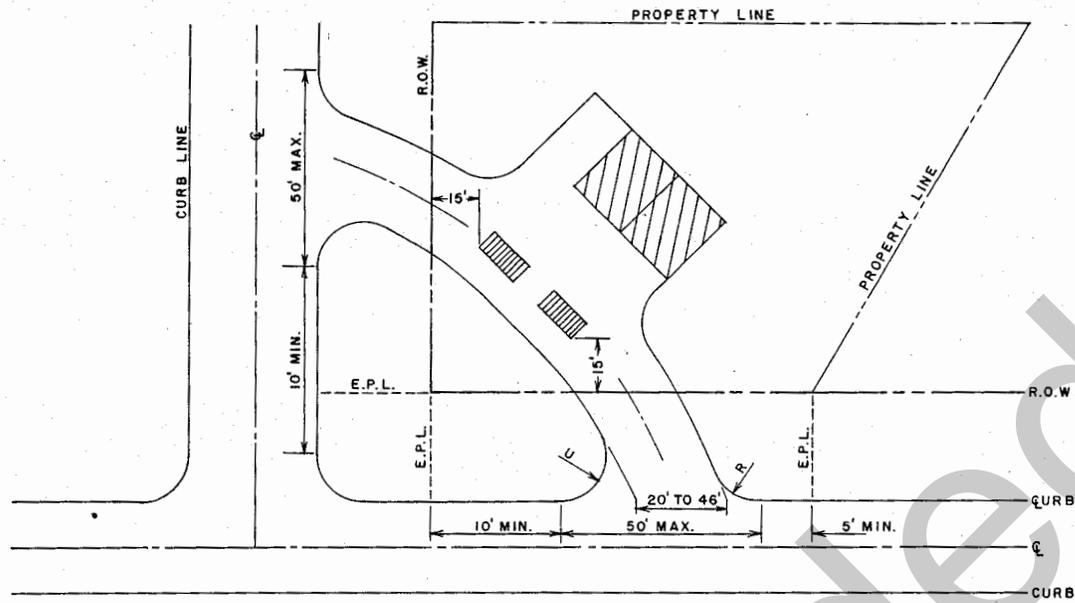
DRIVEWAYS TO A PUBLIC BUILDING: Figure 11 shows two driveways connecting to a sizeable roadside development along an undivided highway. The driveways are planned for one-way use to fit the internal circulation pattern. This pattern would be applicable for a public building as shown, or a shopping center, factory, motel, or the like.
